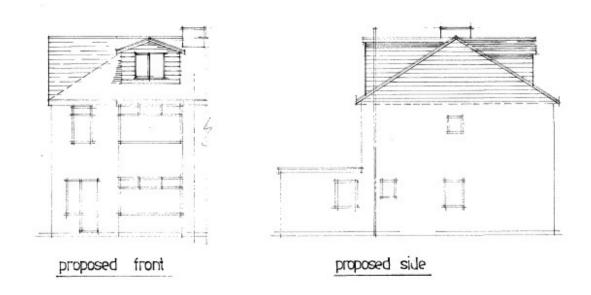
above elevations: the third application, refused and dismissed at appeal, 19/00265/HOU
